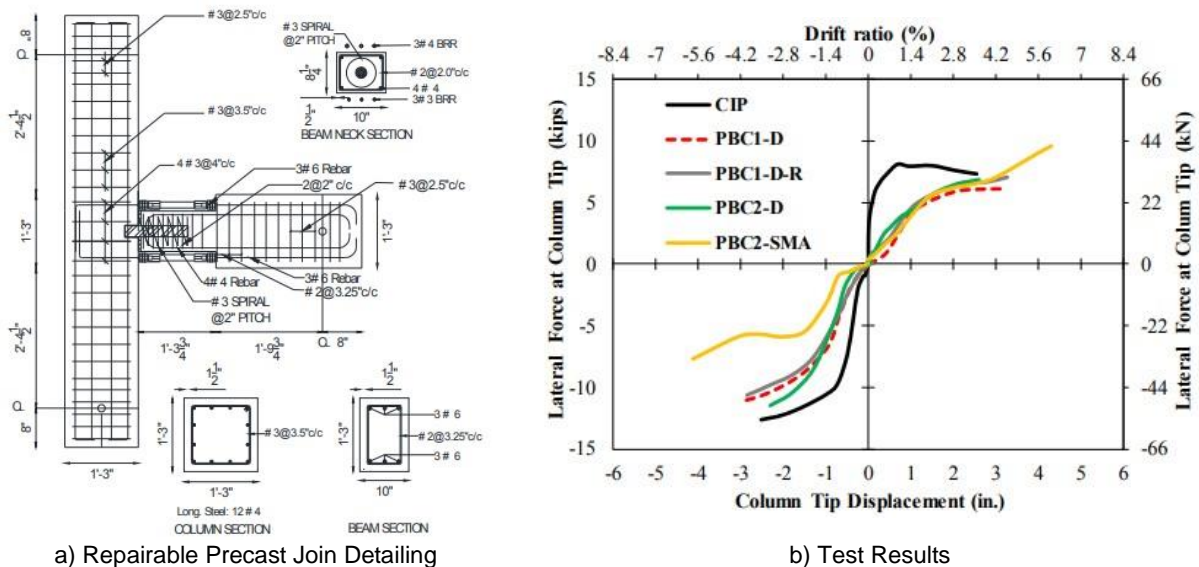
Repairable Precast Beam-Column Joint detailing and Test Results (Tazarv et al., 2020)
